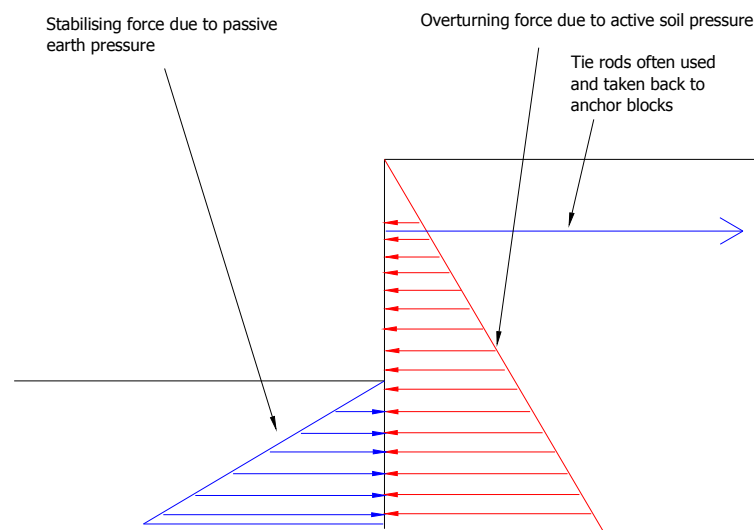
Schematic diagram of a sheet piled wall showing the overturning and restoring forces
